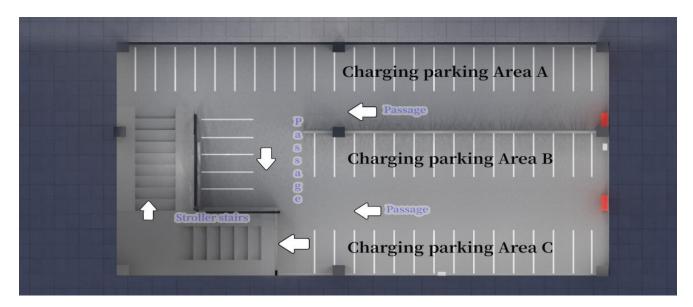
The second-floor layout of the prefabricated multi-story electric bicycle parking lot (Source: Design by Liya Fang)
